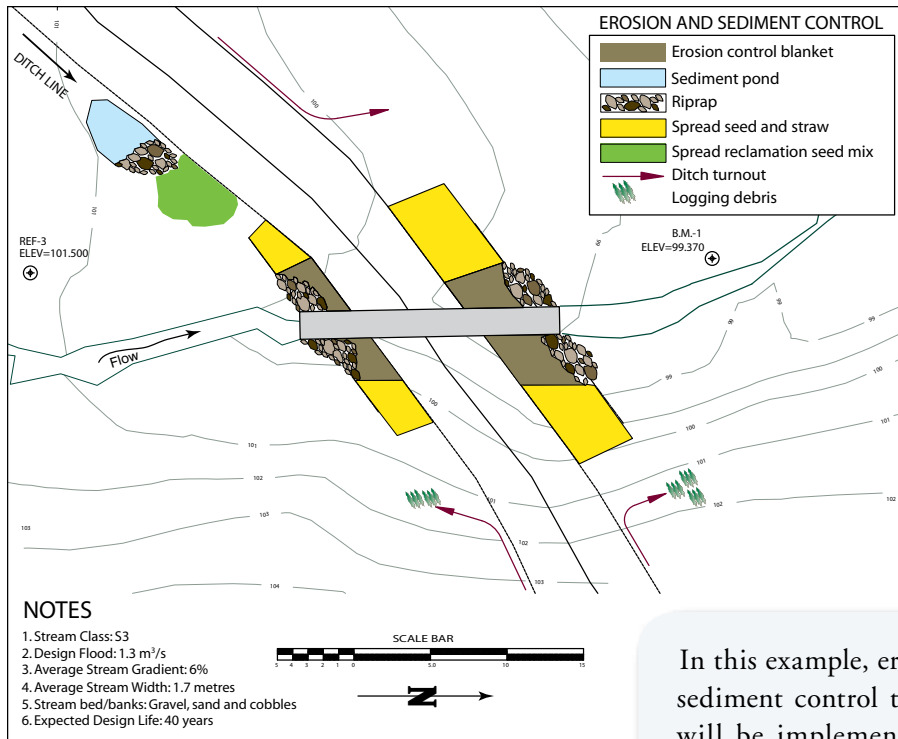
Example of incorporating aspects of an erosion and sediment control plan within a site plan for a culvert installation.
